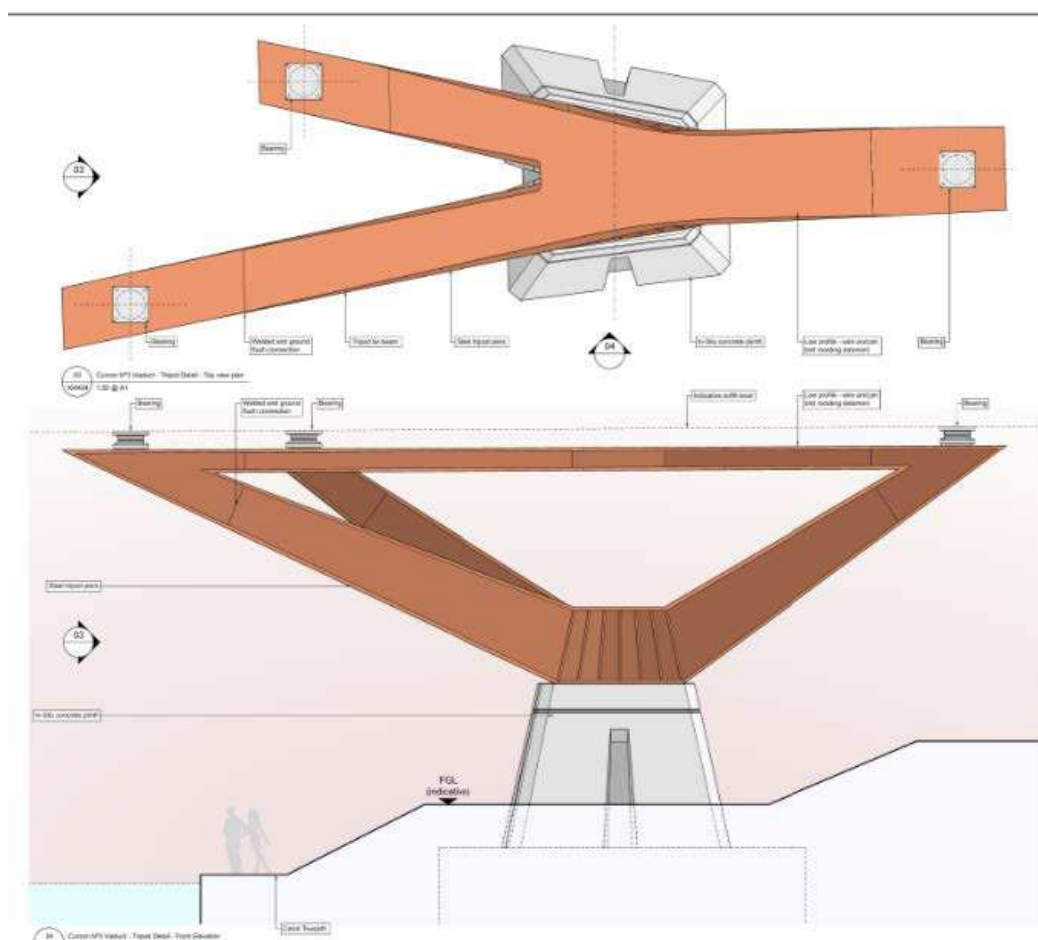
Details of the bespoke designed Tripod pier proposed over the Digbeth Branch Canal.
